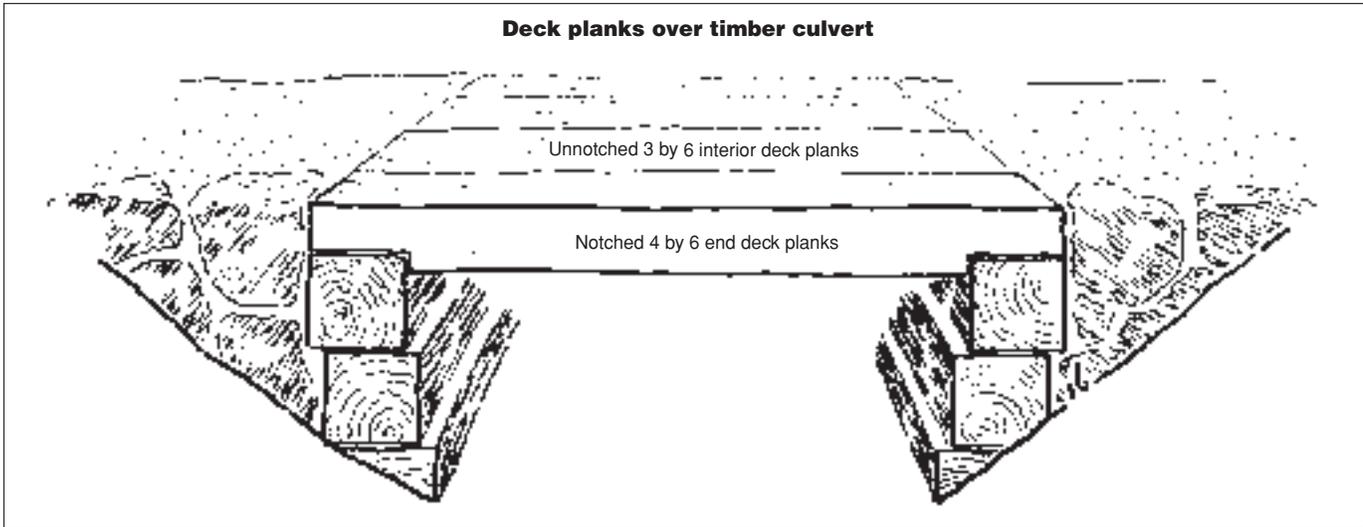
Notching the deck planks on both ends of the culvert (two planks with notches are adequate for a wall up to 24 inches high) helps to brace the walls.
